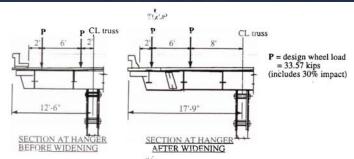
Truck Loads on Floorbeam Cantilever
